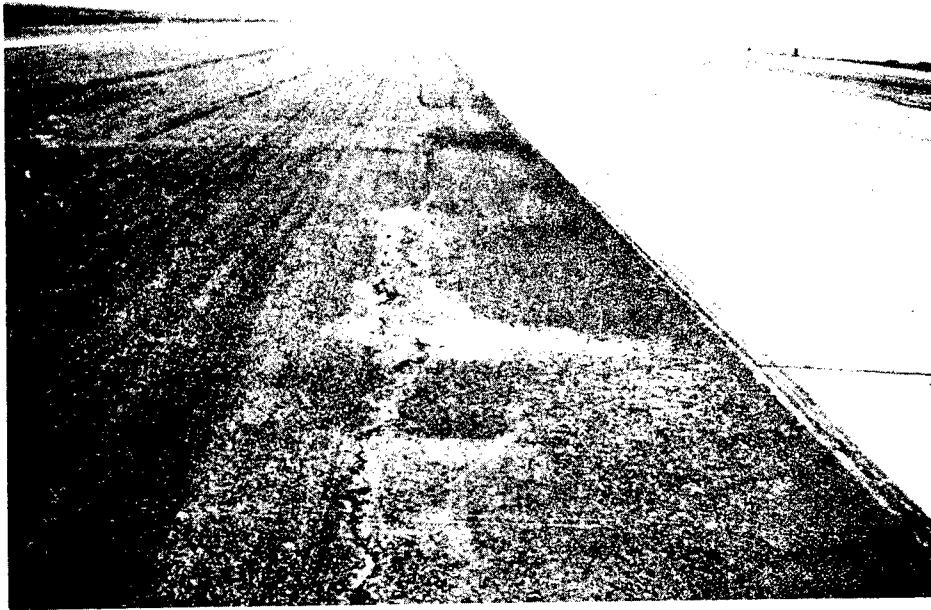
Medium severity longitudinal crack, flexible pavement, case 3
